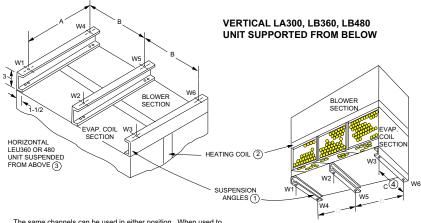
DETAILS FOR SECURING BOTTOM MOUNTING SUPPORTS
